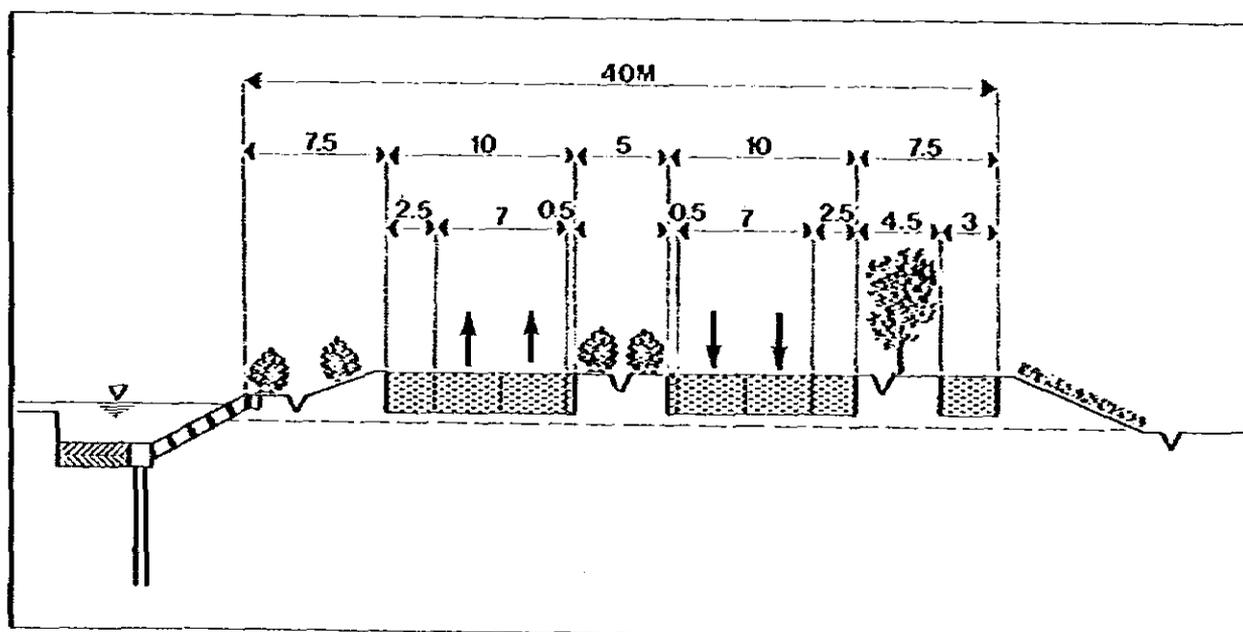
TYPICAL CROSS SECTION OF THE TOLL EXPRESSWAY ACCESS ROAD
